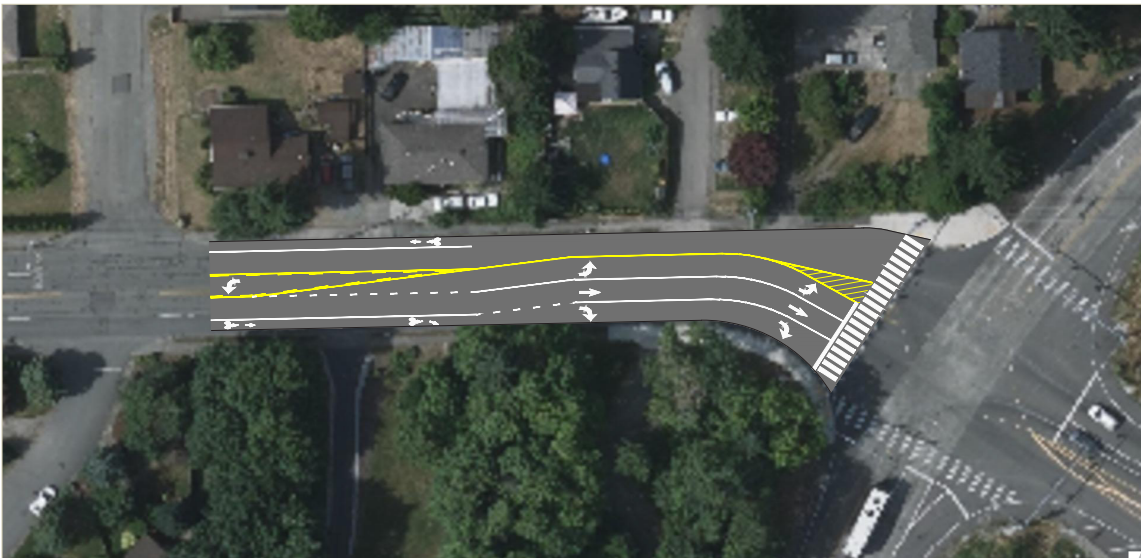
TRANSITION FROM THREE-LANE CROSS-SECTION TO EXISTING CROSS SECTION AT MILITARY ROAD SOUTH
